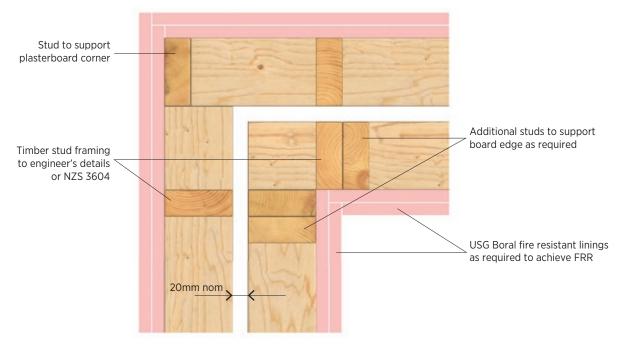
Twin Timber Stud Wall – Corner Junction Detail
